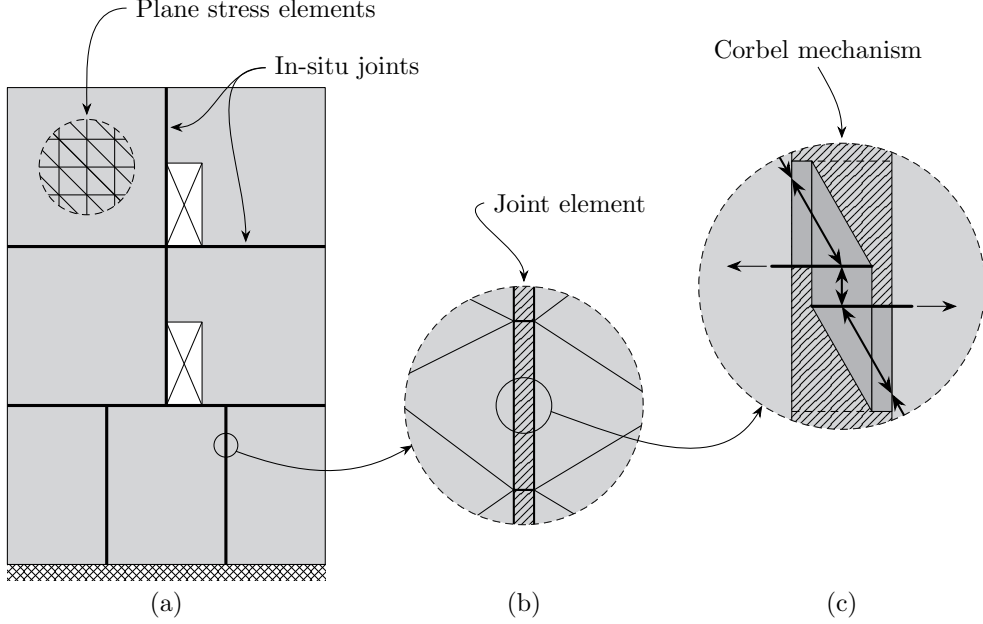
The general concept of the multiscale joint element shown in 2D: a) Precast concrete structure on the structural level, b) Joint element and plane stress elements on the element level, c) corbel mechanisms and load path on the submodel level.
